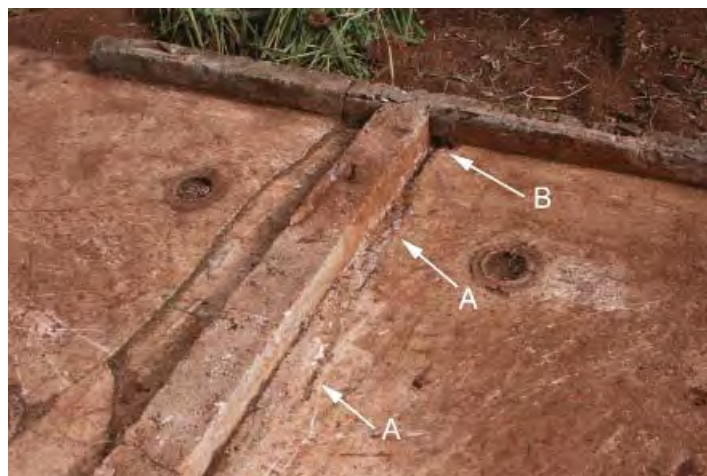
Feature V-26, latrine and shower foundation detail showing chiseled drain (A) and hole through wall (B) (2009).
